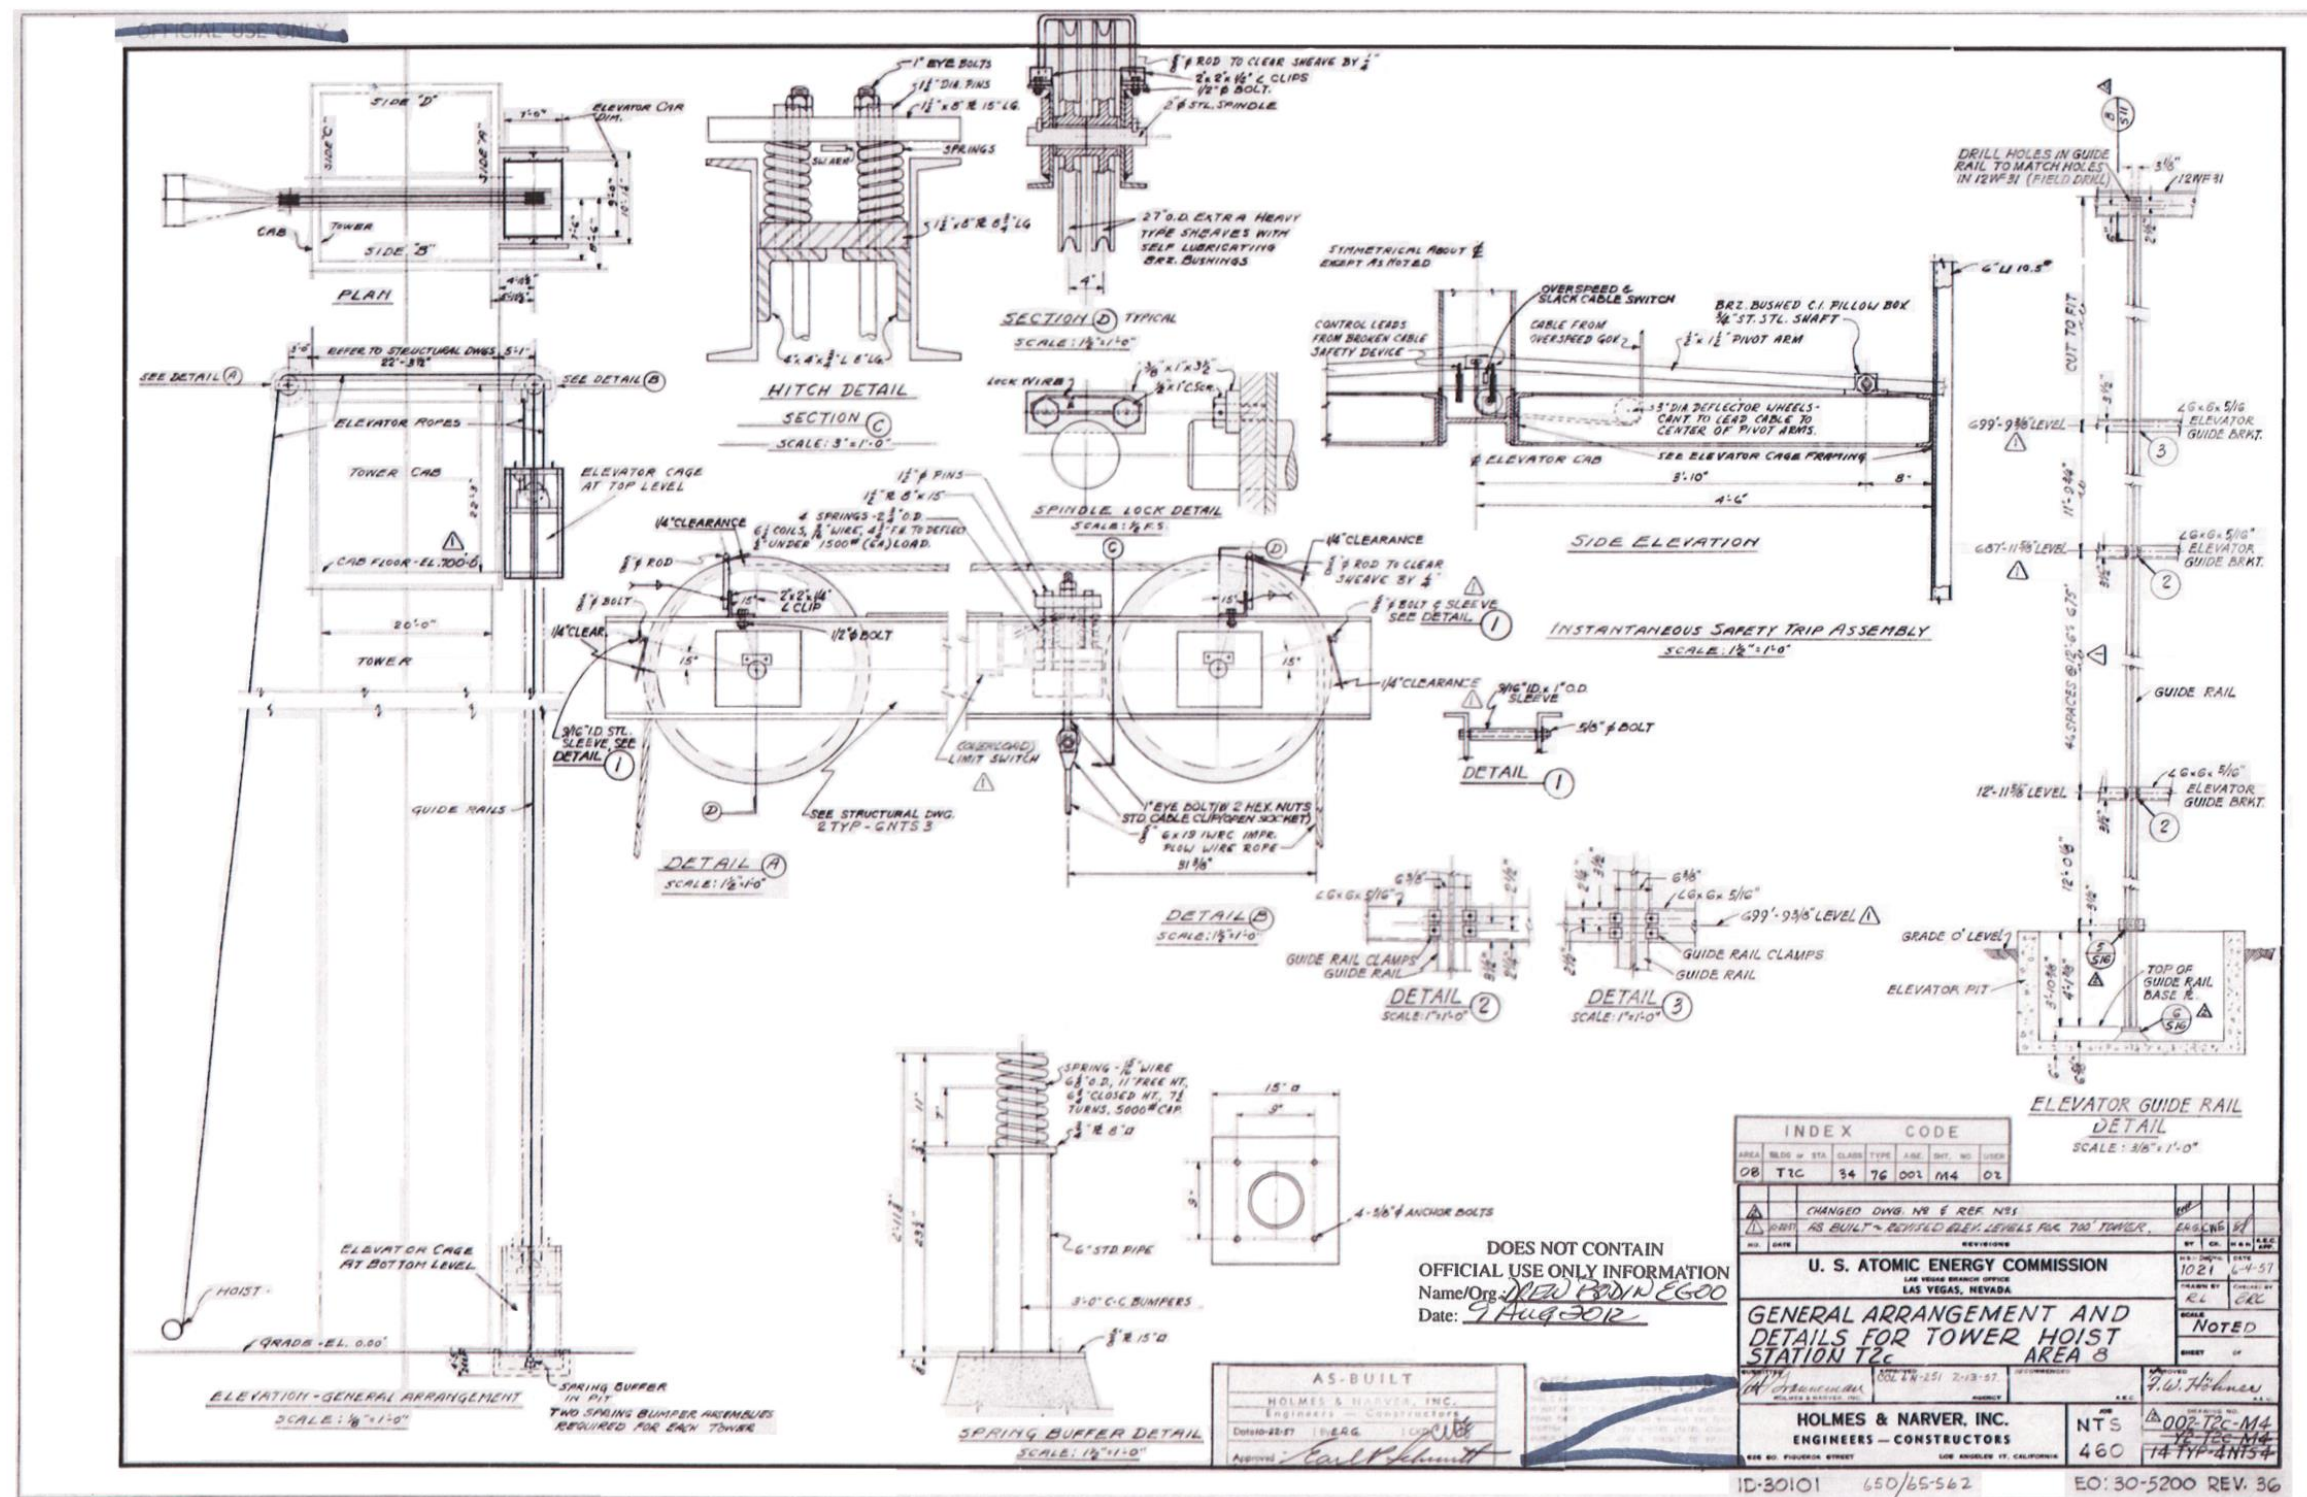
Smoky 700 ft tower cage general arrangement and details for elevator hoist.
